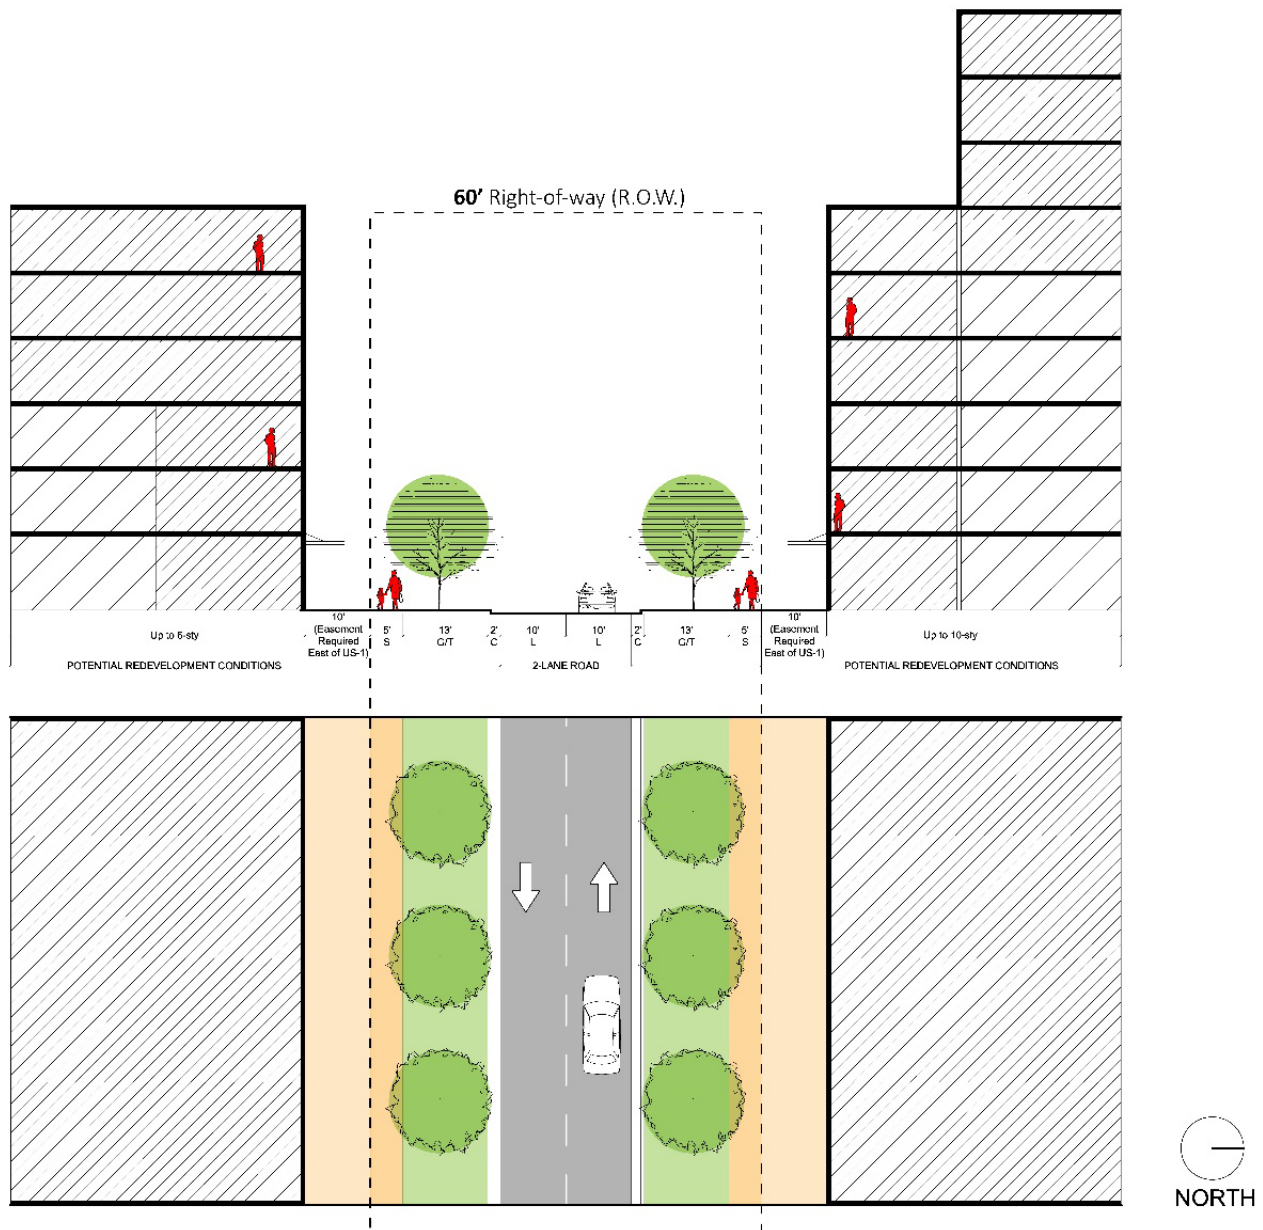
F.8: Tertiary Streets with No Parking Street Design
